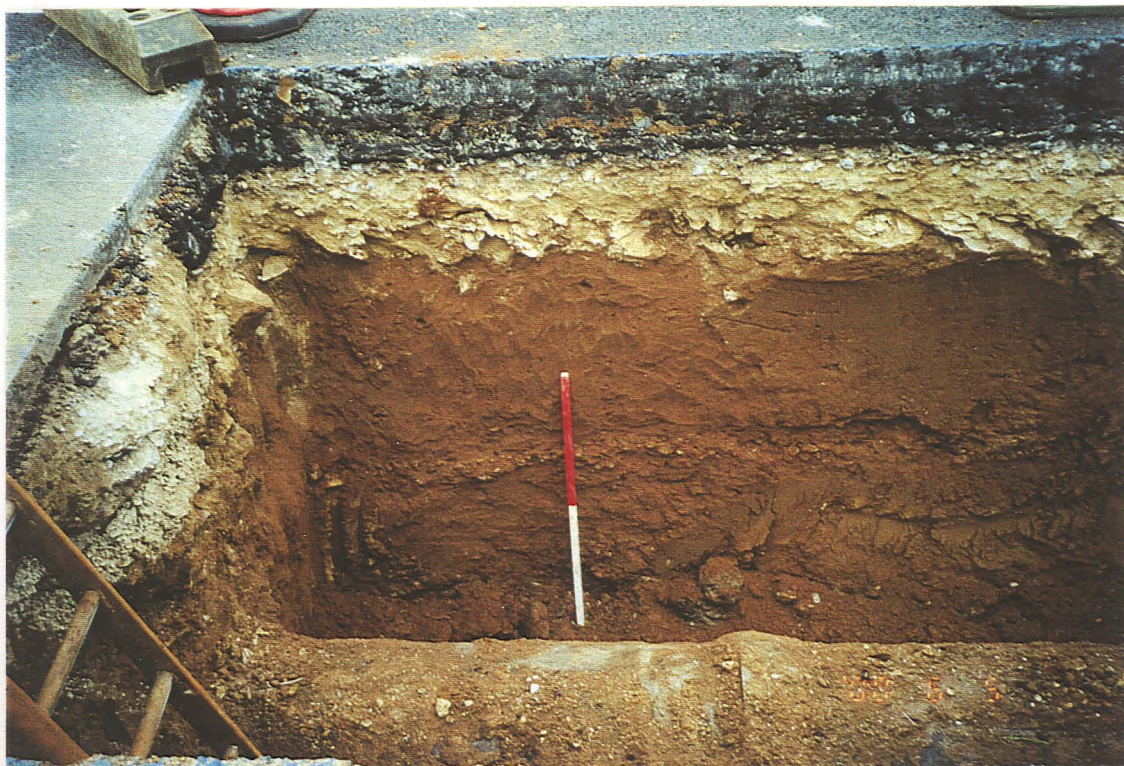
Access Pit 29, west facing section, with the possible Roman road surface, (532), visible half way up the red section of the vertical scale, looking east.
